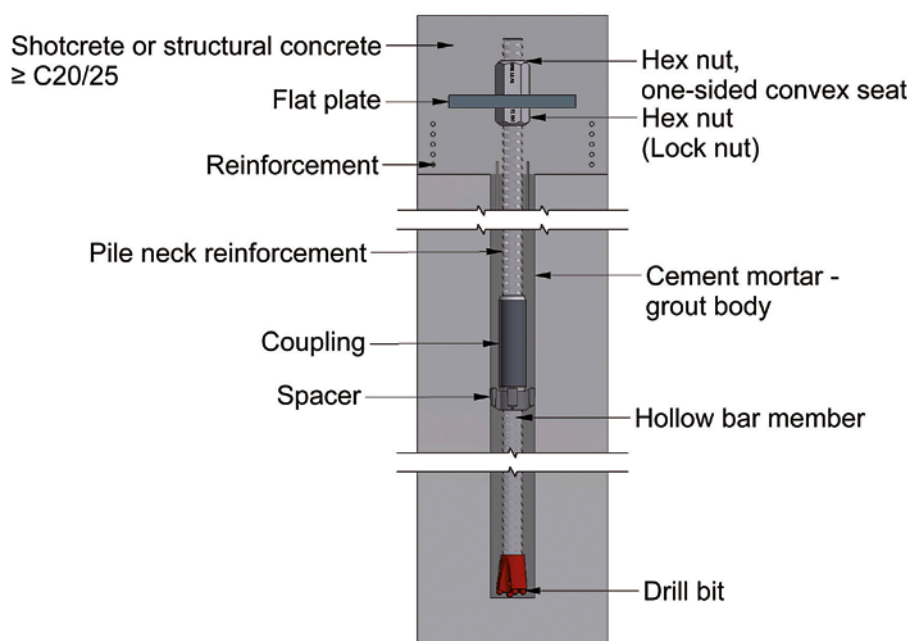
System sketch of DYWI® Drill Hollow Bar (source: DSI Underground)
